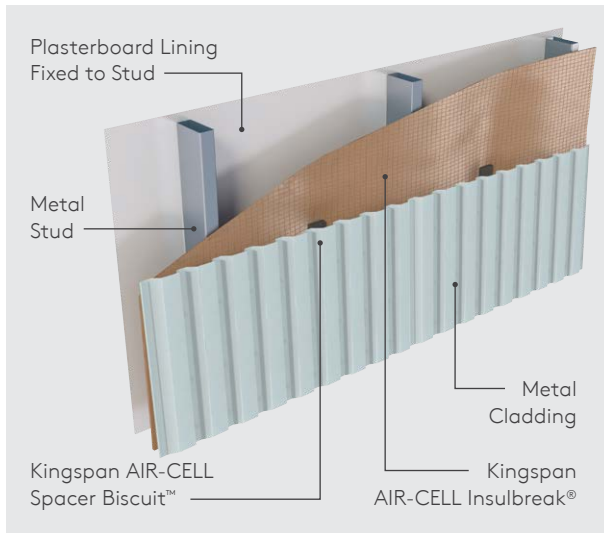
Kingspan AIR-CELL Insulbreak® on steel-framed wall.
